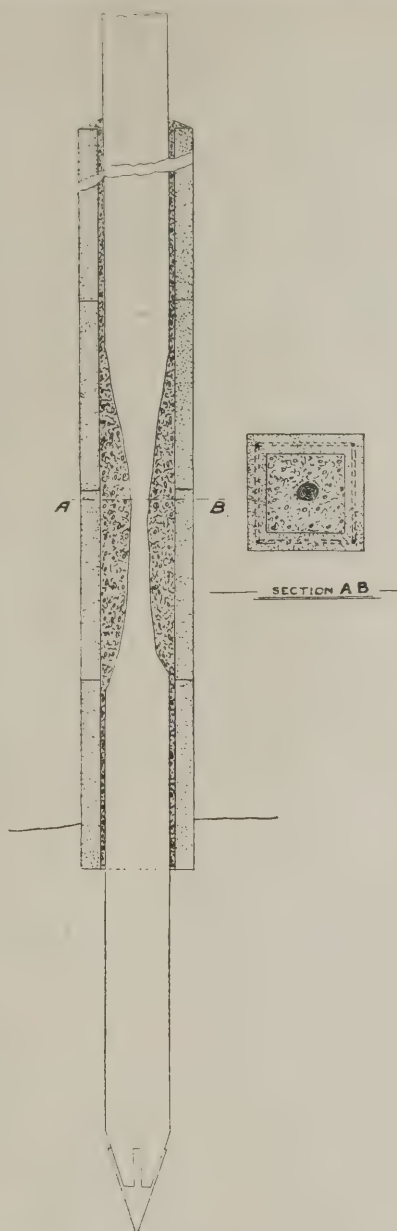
SECTION OF OLD PILE ENCASED WITH REINFORCED CONCRETE.
